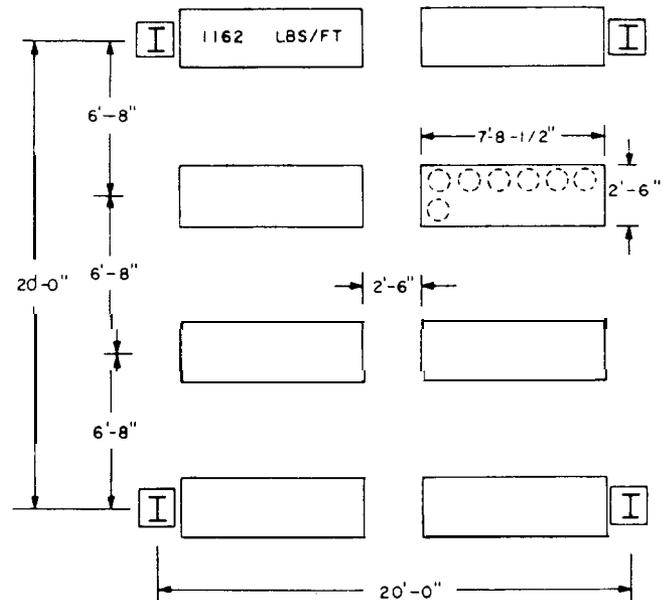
Battery Floor Plan (150#/7' Floor Loading)
